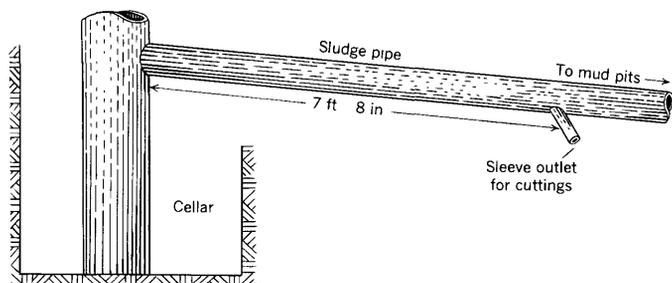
Arrangement for collecting cuttings from holes F-1 and E-1.
